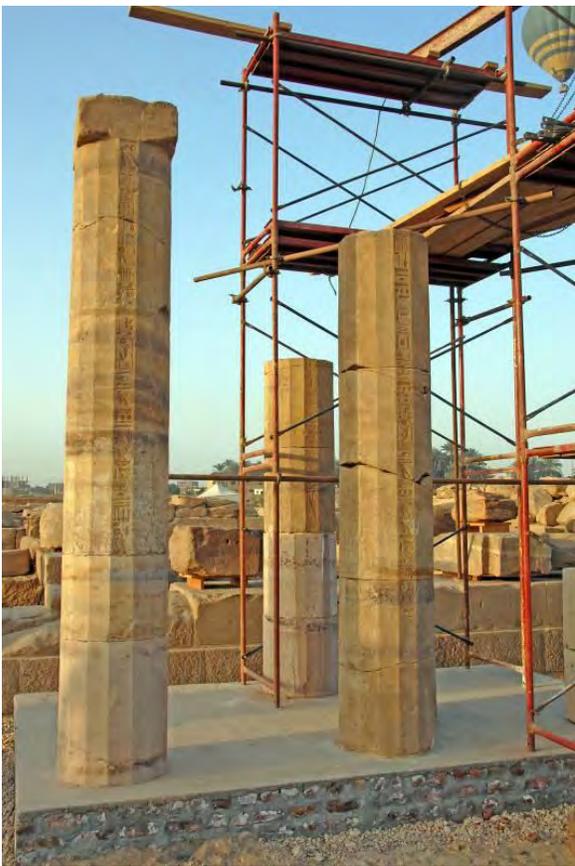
Columns of the Porch of Drunkenness during reconstruction, March 2009
